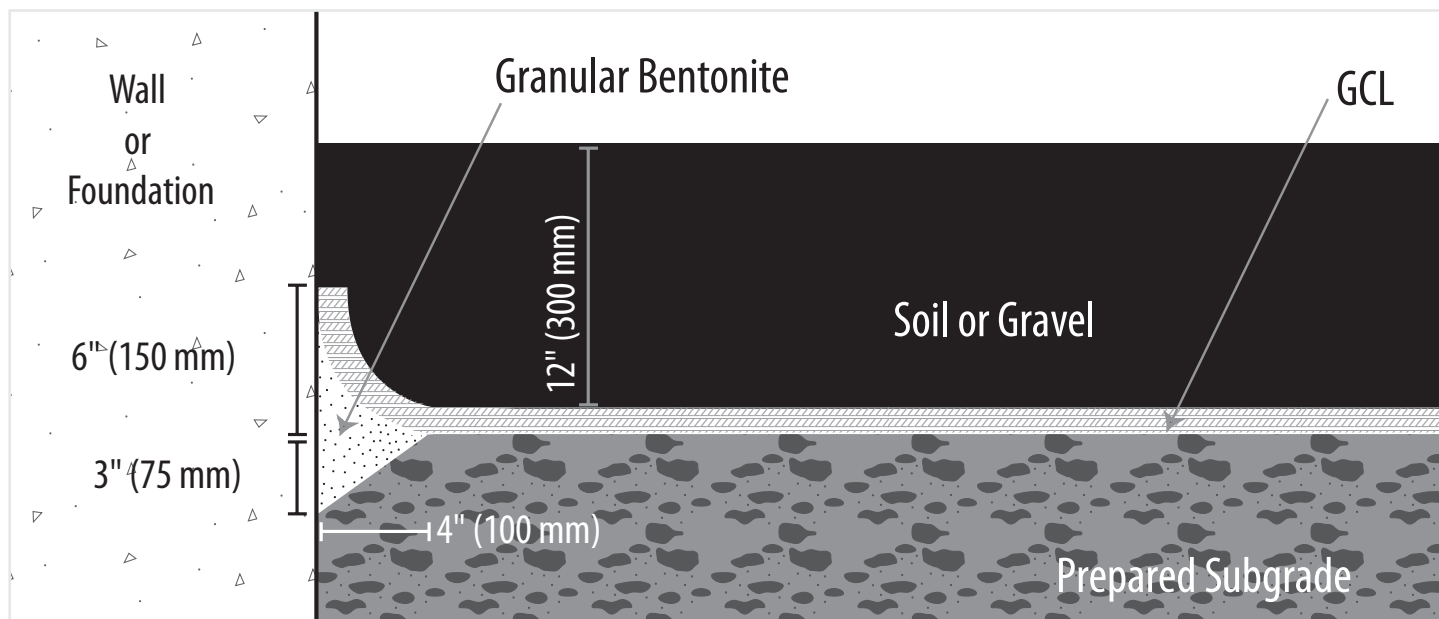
CROSS-SECTION OF GCL SEAL AGAINST AN EMBEDDED STRUCTURE OR WALL
